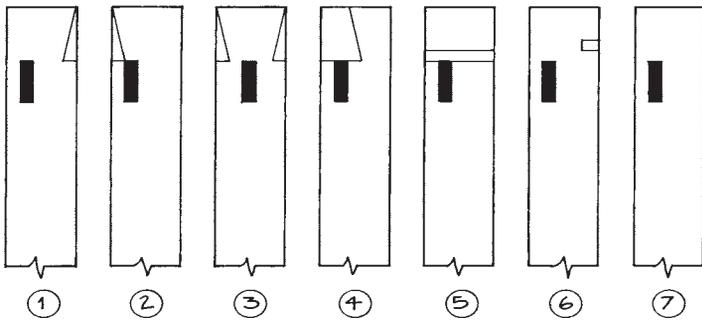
Undersides of tie beam ends showing half-dovetails (1, 2, 4), full dovetail (3), cog types (5, 6) and one example (7) merely trenched across the plate.
